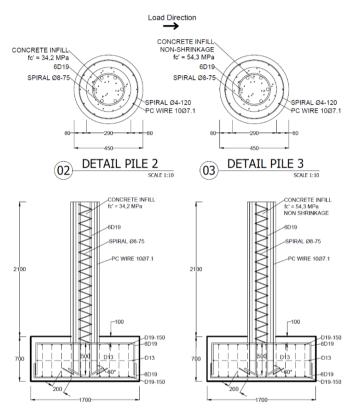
Details of SPPC 02 and SPPC 03 specimen
